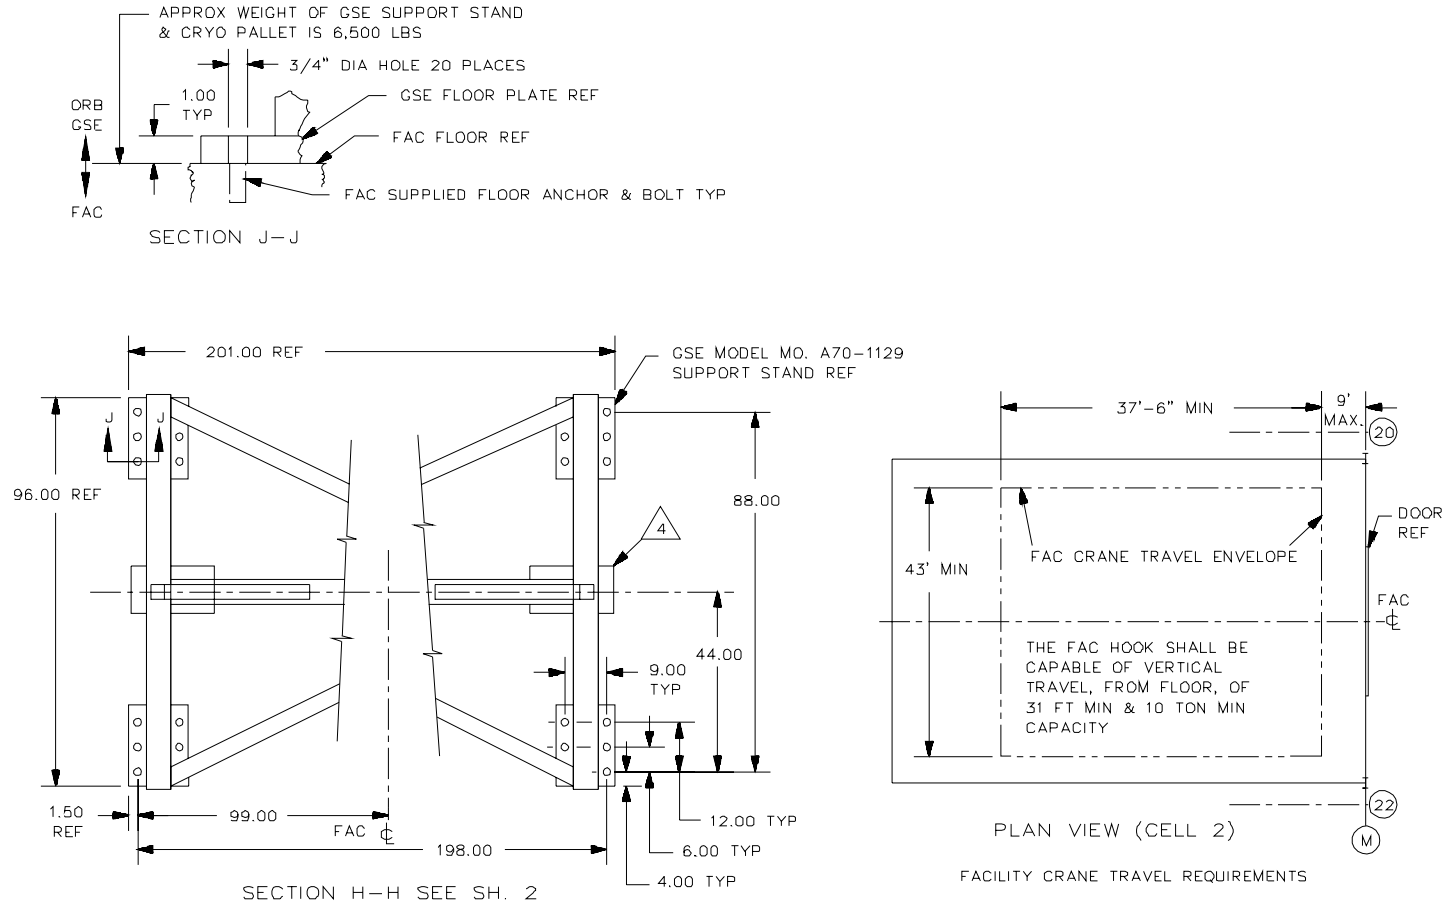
GSE SUPPORT STAND & PLATFORM CLEARANCES
